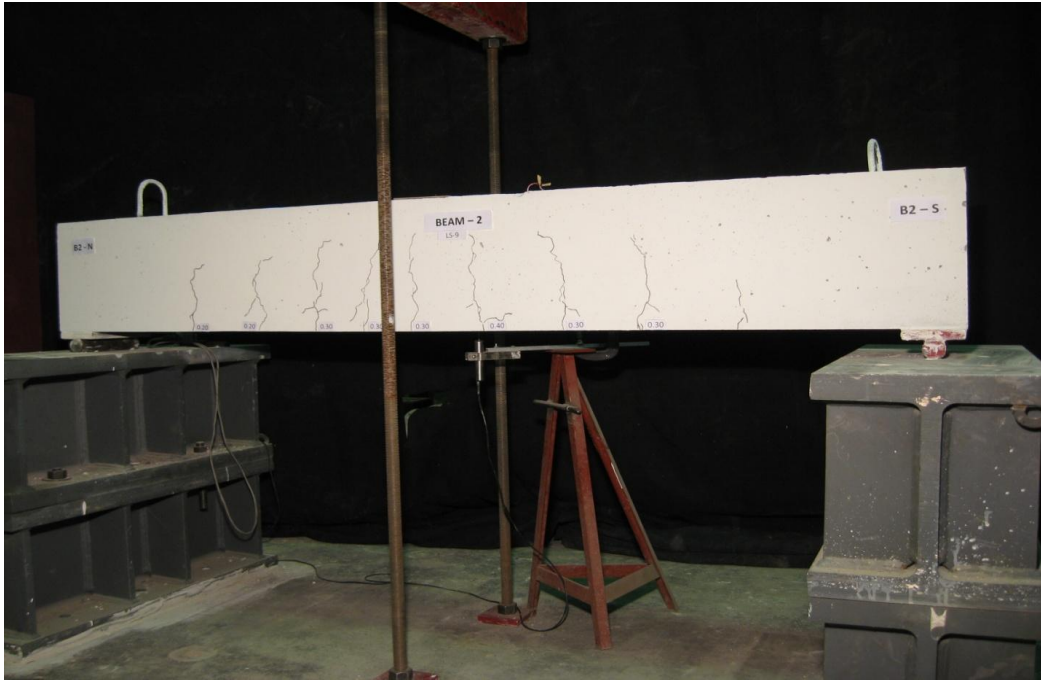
Cracking pattern for beam 2 at a load of 80.4 kN (B2-LS9)
